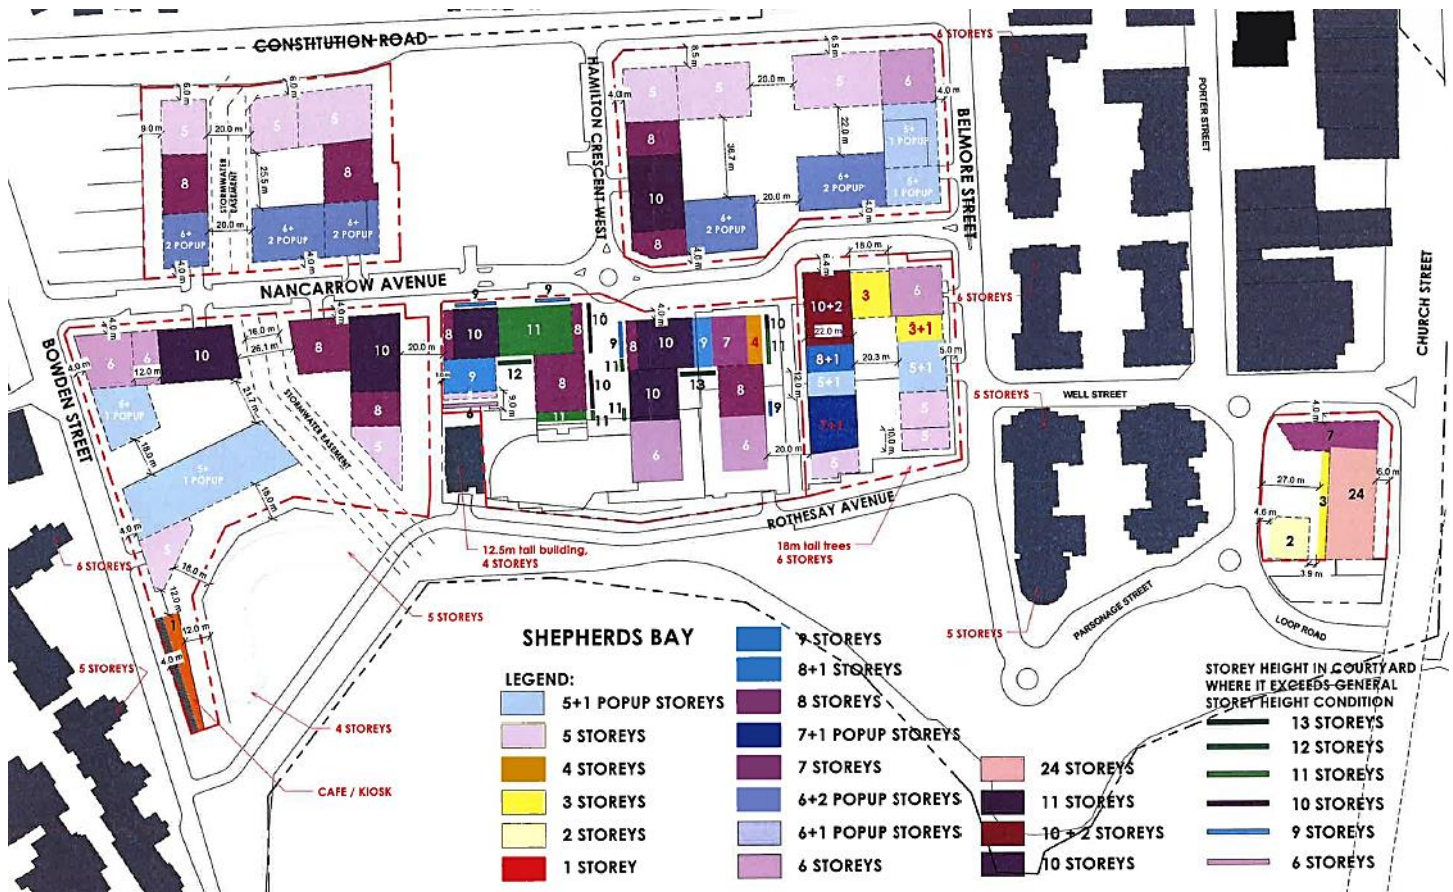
Modified Concept Approval Plan – Maximum Number of Storeys Above Ground Level (Finished) Plan.
